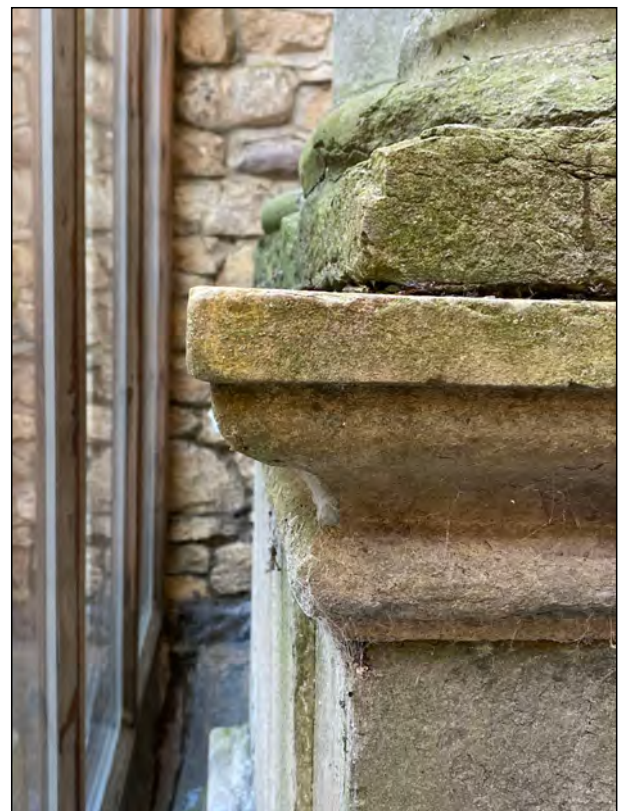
Detail of upper NW corner of column pedestal on east side of doorway.
